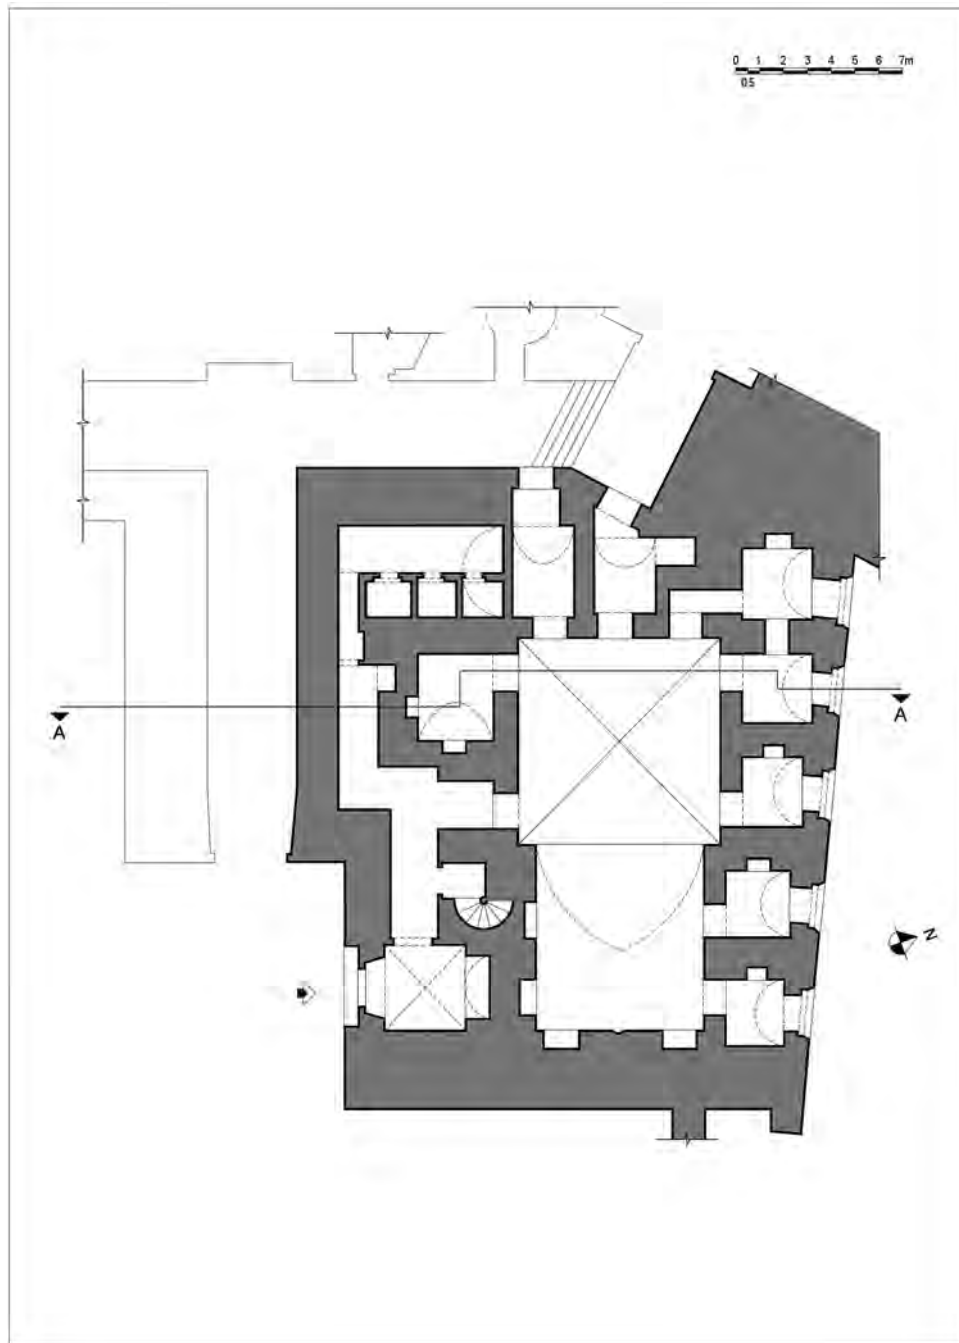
Mālīkiyah Madrasah, Complex of Sultan Ḥasan, Cairo, ground floor plan (H. Al-Harithy)
